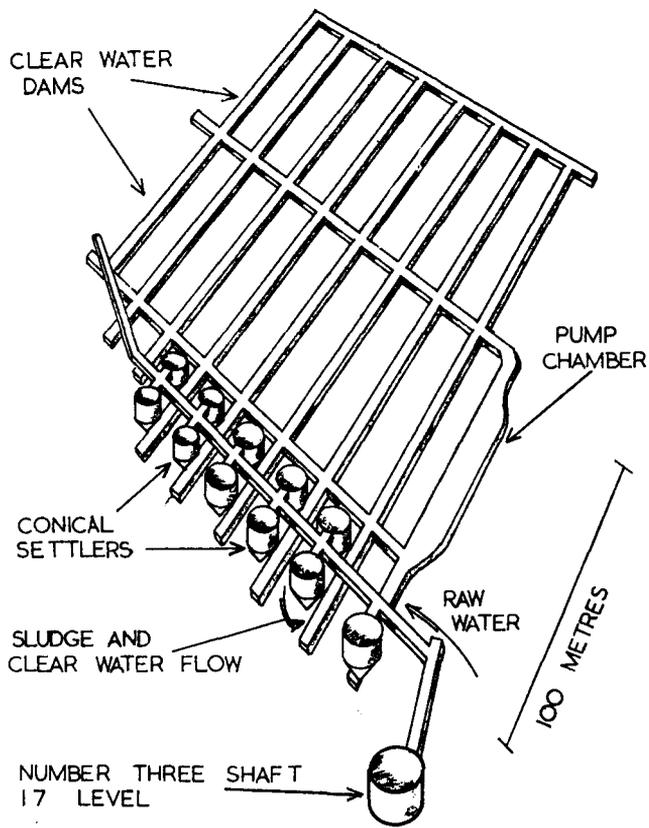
Isometric view of the pump chamber, clear water dams, and conical settlers
